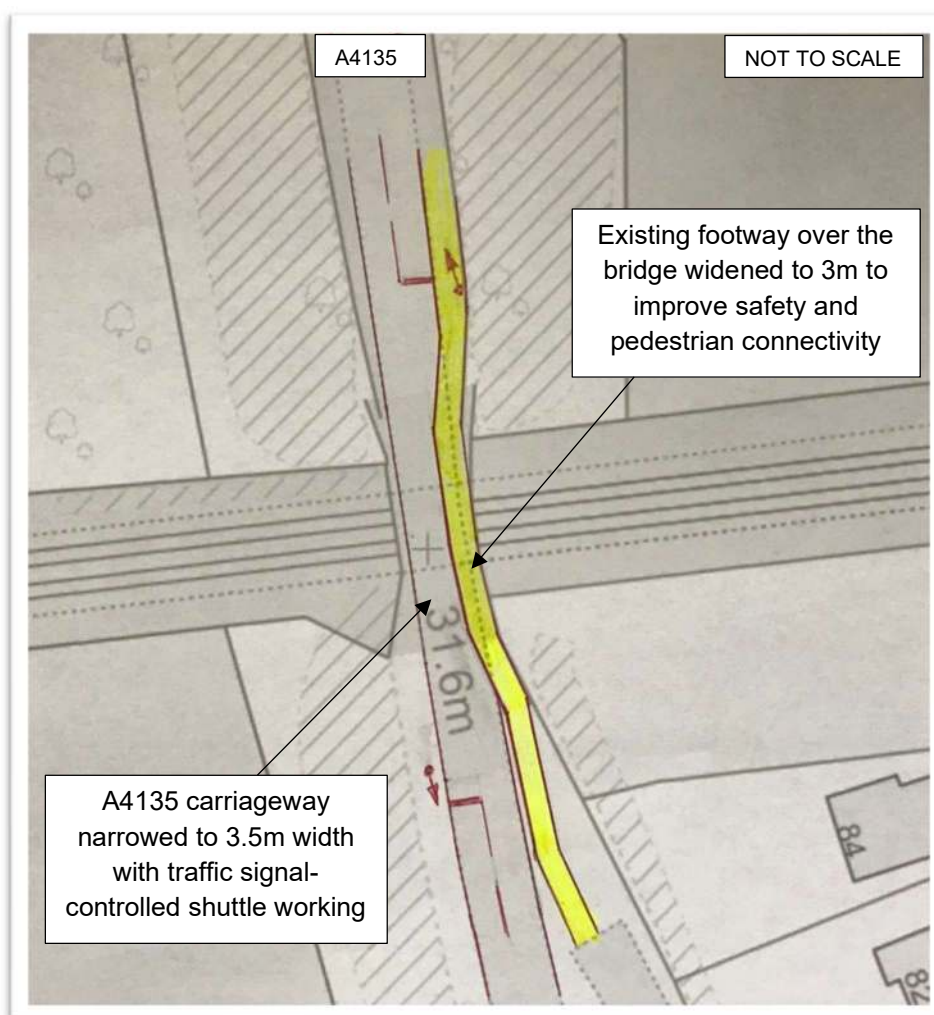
Shuttle Signals and Improved Footway at Railway Bridge
